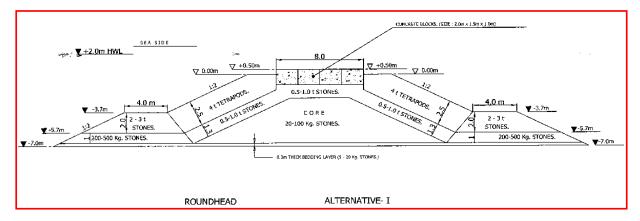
Cross-section of offshore reef with stones in the armour and crest for the roundhead portion.
